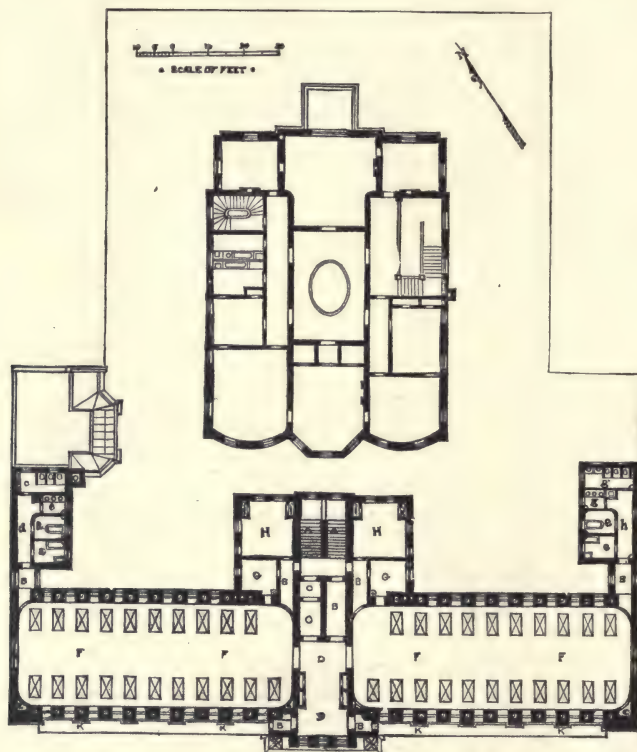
NEW YORK HOSPITAL BUILDINGS.—PLAN OF SECOND, THIRD AND FOURTH STORIES.
